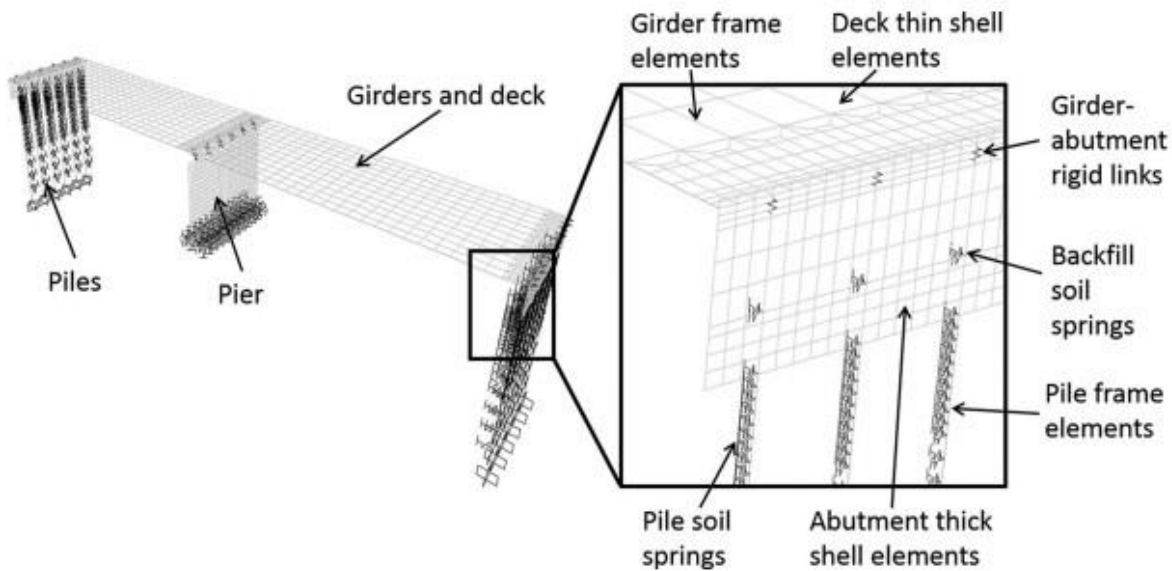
IAB model in SAP2000 considering detailed abutment and pile models as well as a modeled pier column bent (LaFave *et al.*, 2016).
